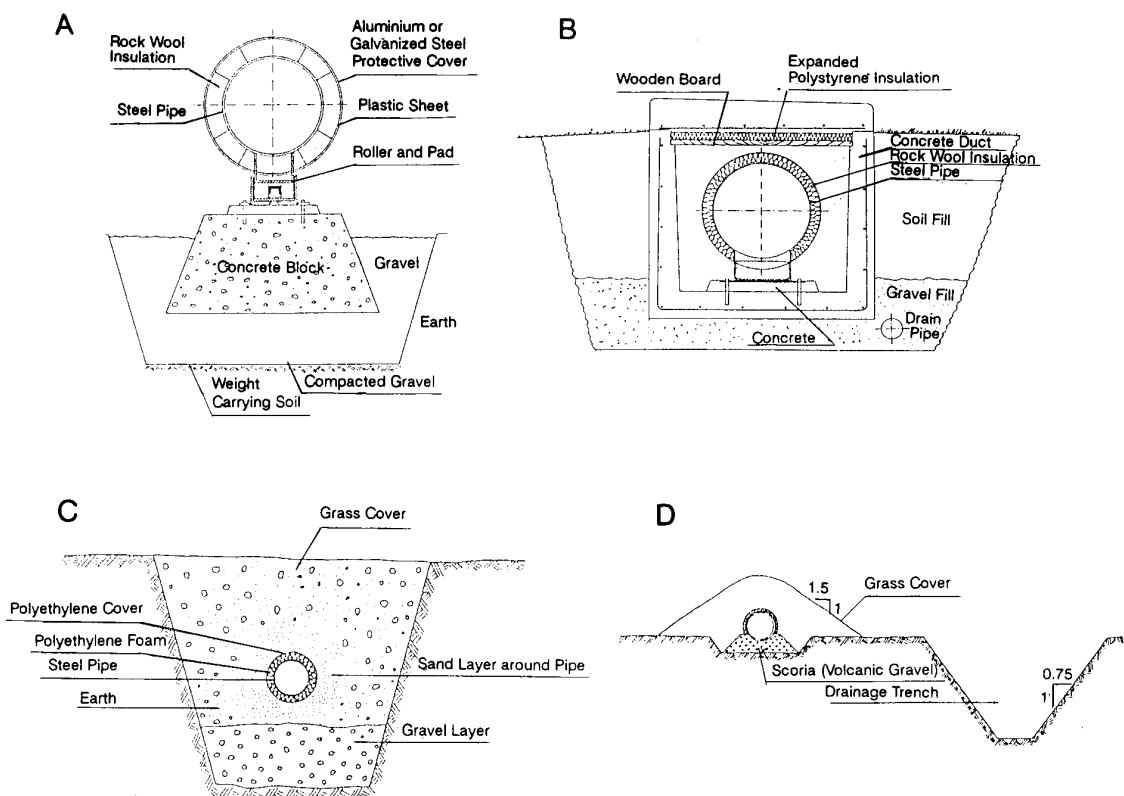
Examples of above and below ground pipelines: a) aboveground pipeline with sheet metal cover, b) steel pipe in concrete tunnel, c) steel pipe with polyurethane insulation and polyethylene cover, and d) asbestos cement pipe with earth and grass cover (Lund, 1996)
